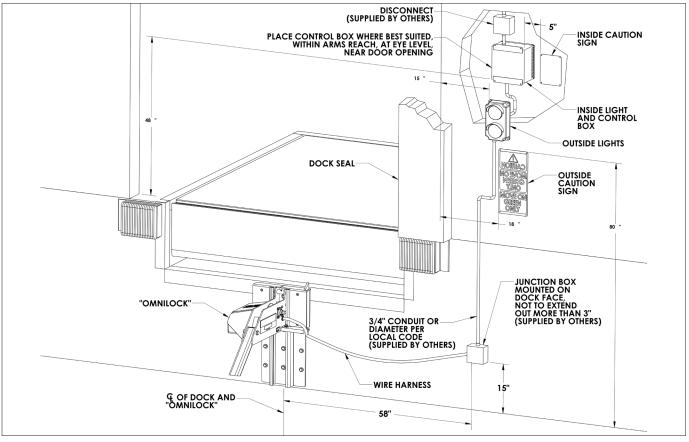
B—SUGGESTED COMPONENT LOCATION
